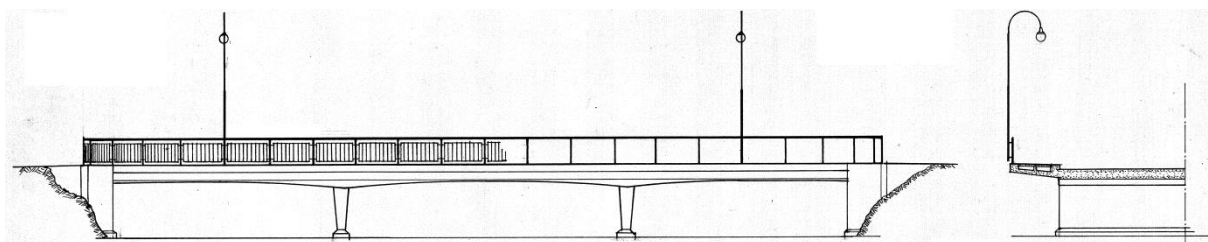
Dallington Bridge elevation, Christchurch City Council drawing
